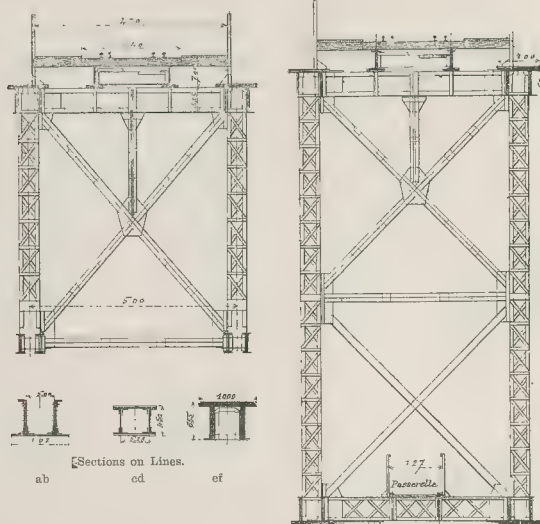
Sitter Viaduct: Details of Steel Girder Span. (From Genie Civil.)
